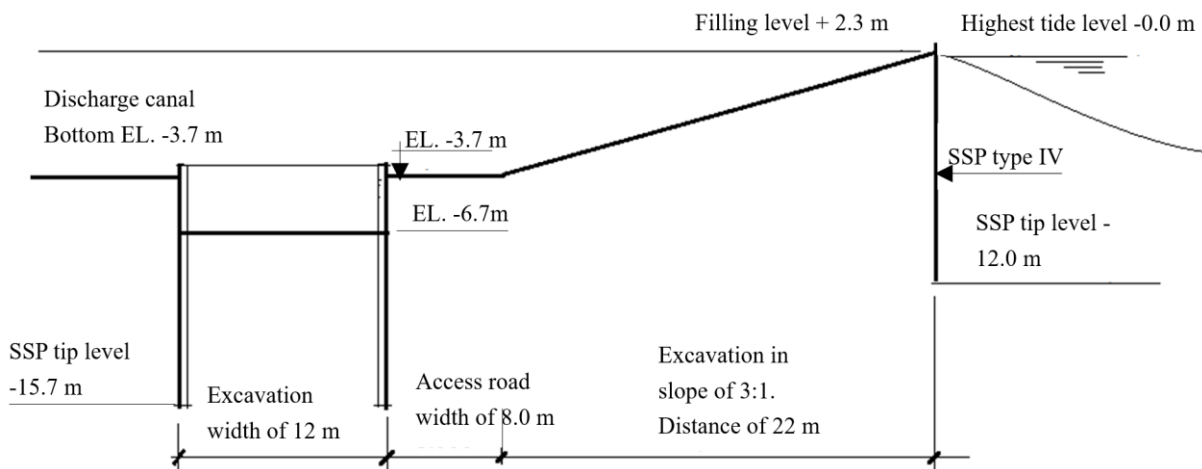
Longitudinal section of the drainage culvert and Pond B (second excavation)
